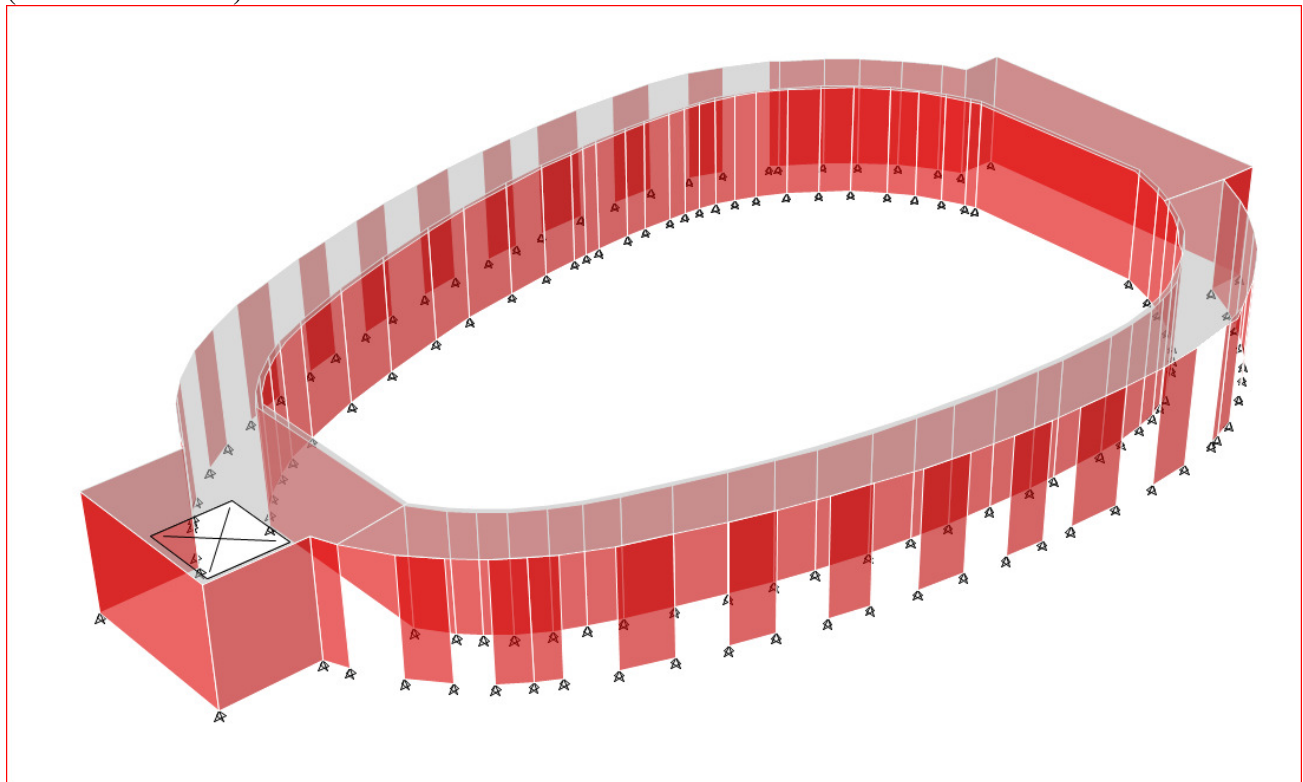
2D View of Ram Elements Design Model of Outer CMU Wall
